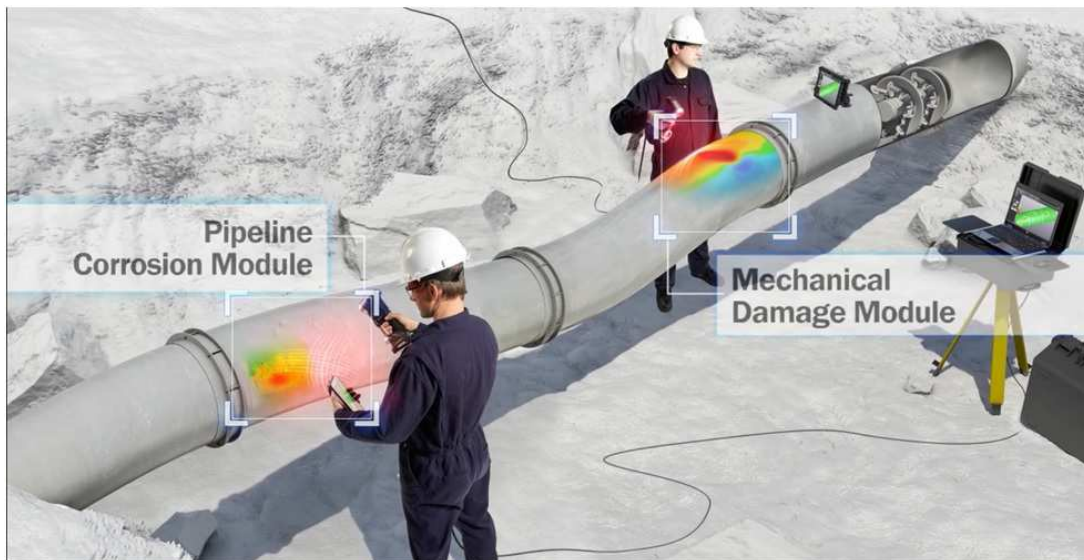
Pigging Device are capable of showing corrosion or mechanical damage to pipelines
